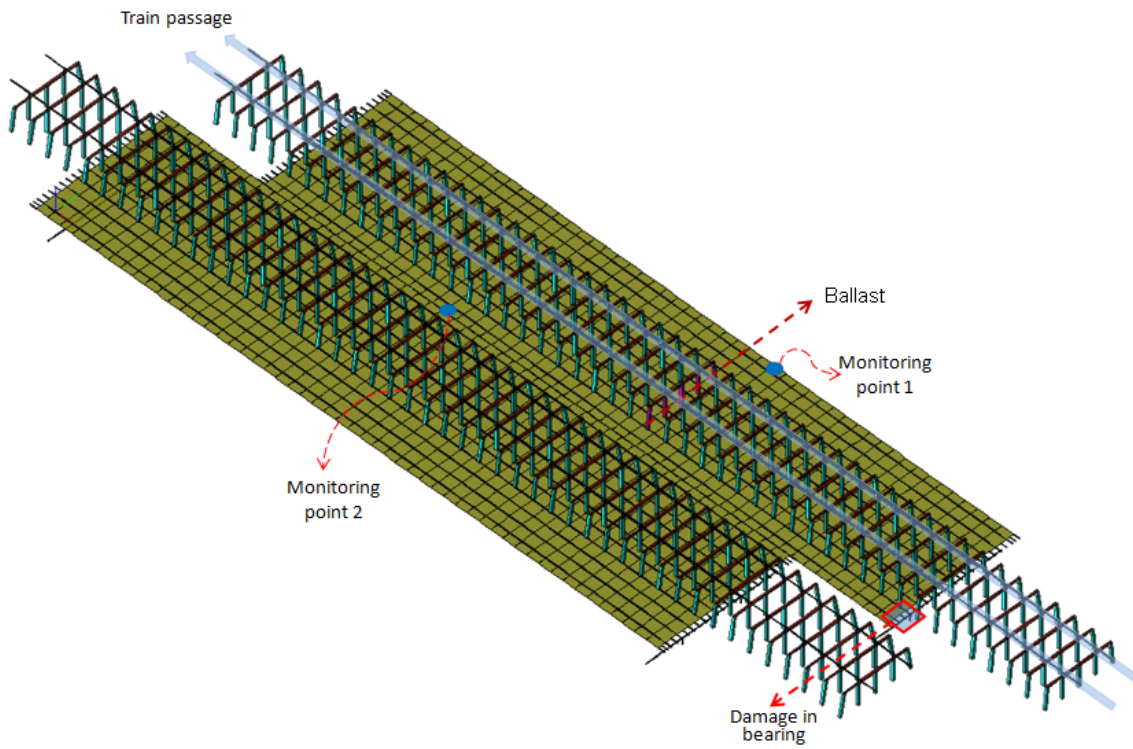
Finite Element model of the Erfthal-Brücke railway bridge
